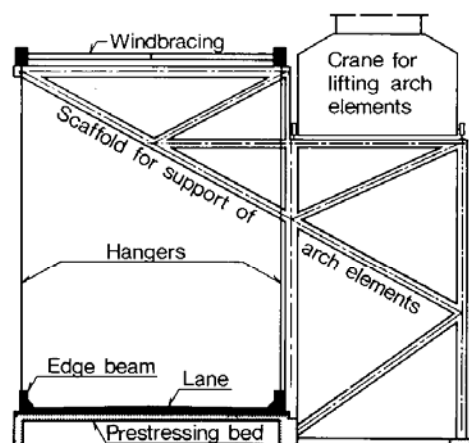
Cross-sections of rig for casting of the lane, edge beam and joints in arches.
